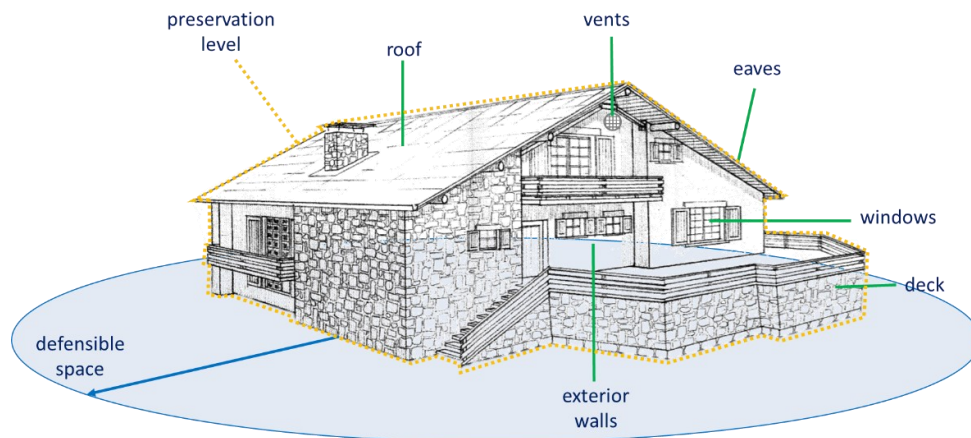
Vulnerable components of generic residential building to wildfires: preservation level, defensible space, roof, vents, eave, window, deck, and exterior wall.
